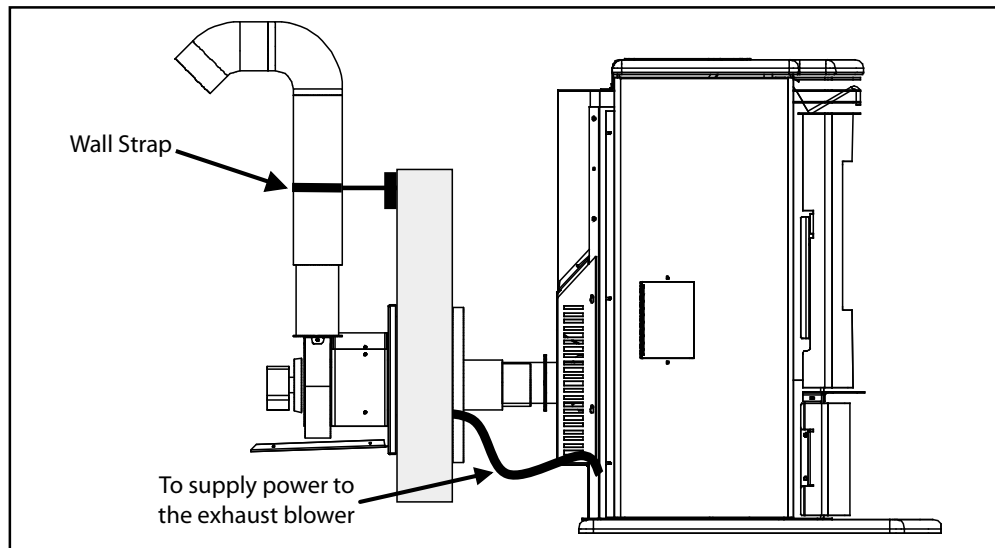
Through Wall Installation with Exterior Blower Kit; Side View.
